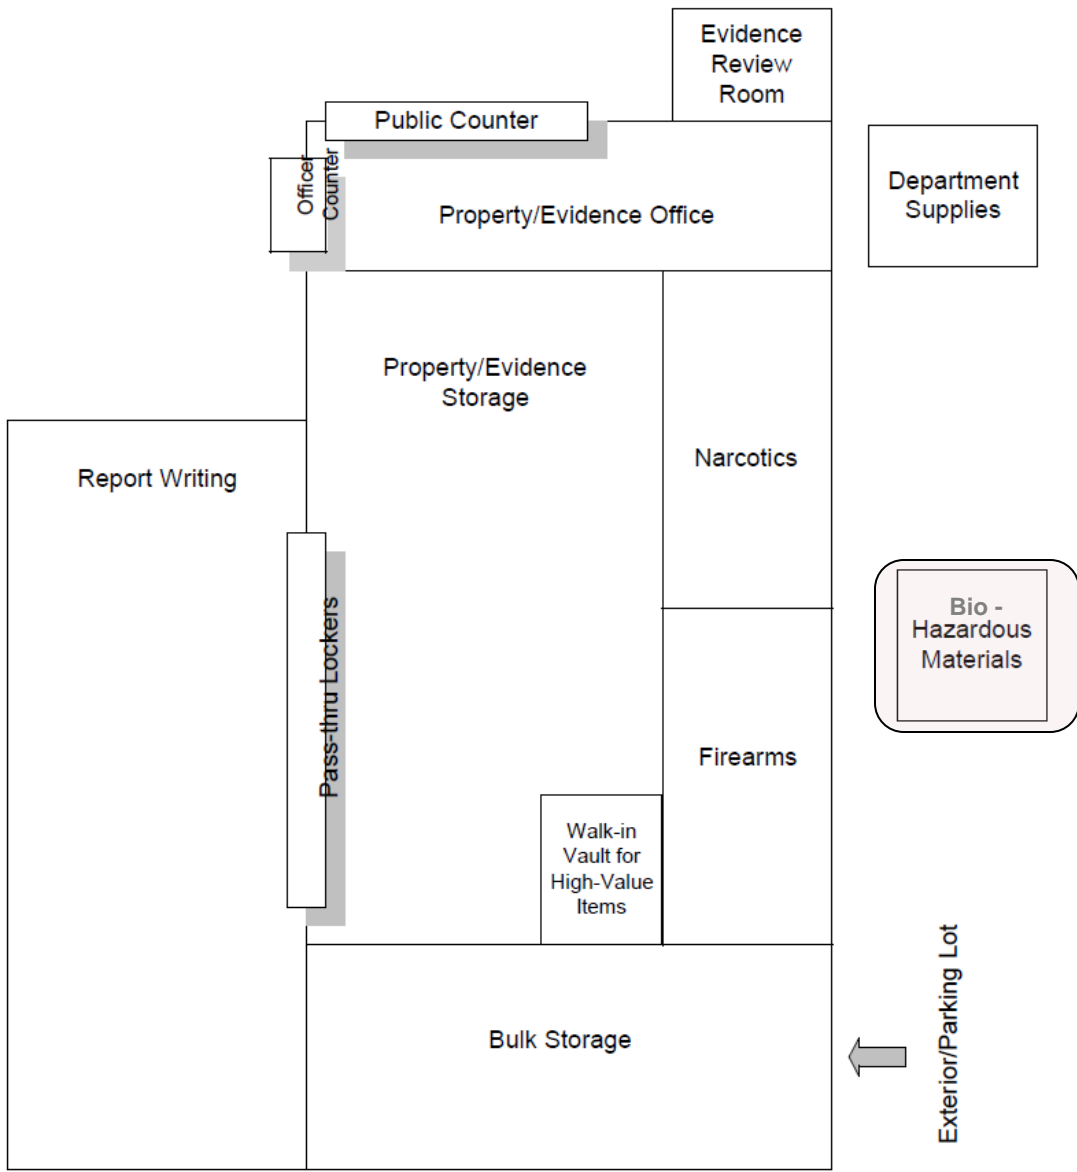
Sample property/evidence room layout (Latta and Bowers 2011).
